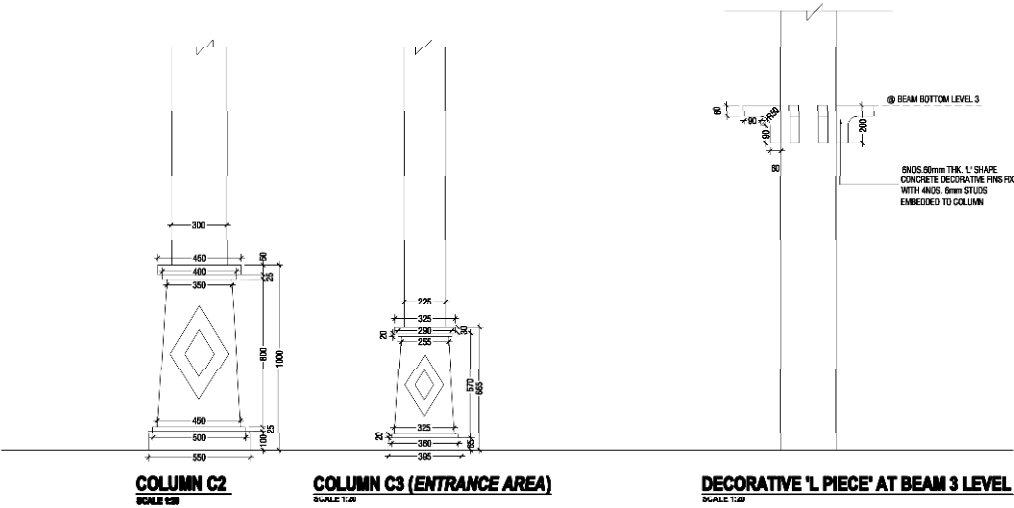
(CONCRETE MOLDING DETAIL)
